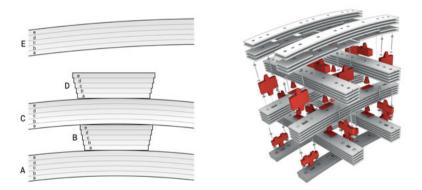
Left: Beam layers composing the roof; Right: detailed roof build up.
